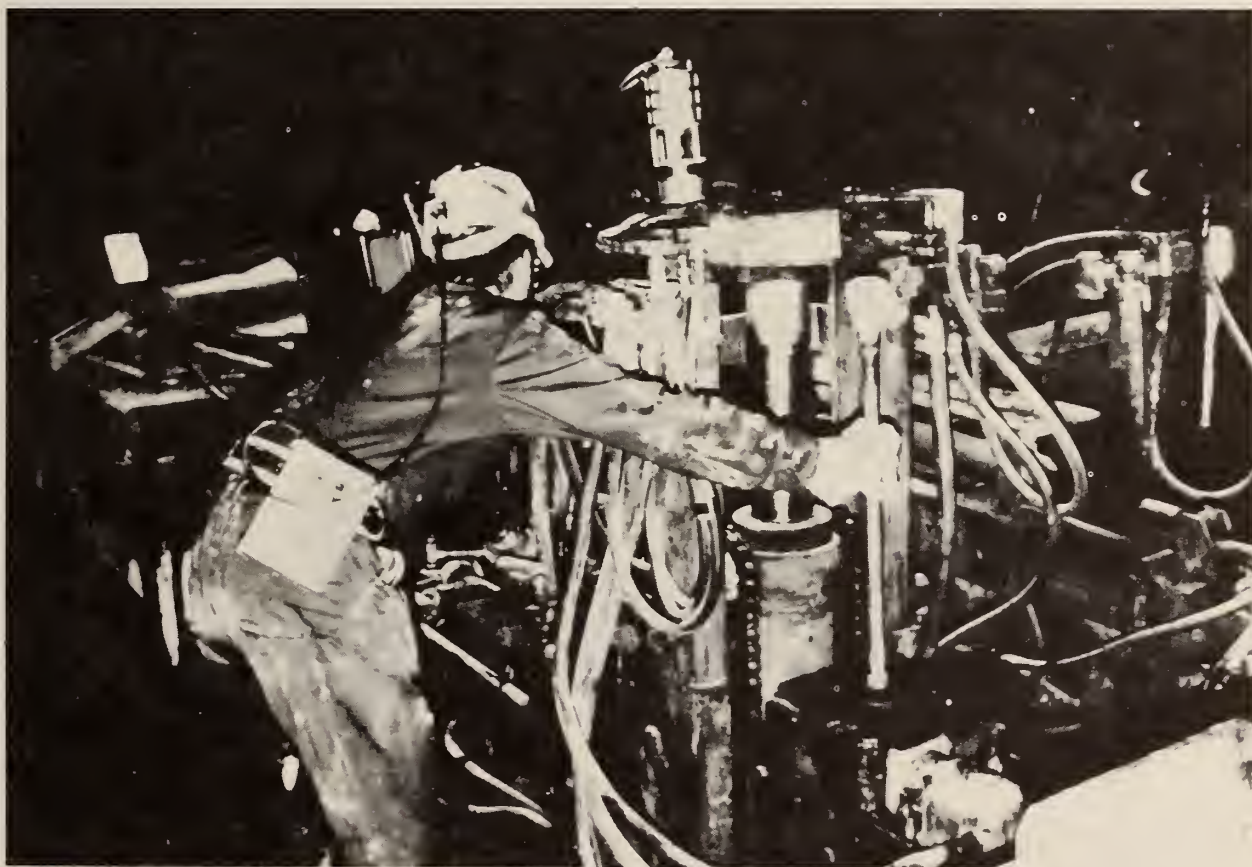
Roof bolter operator engaged in hands-on drilling.
